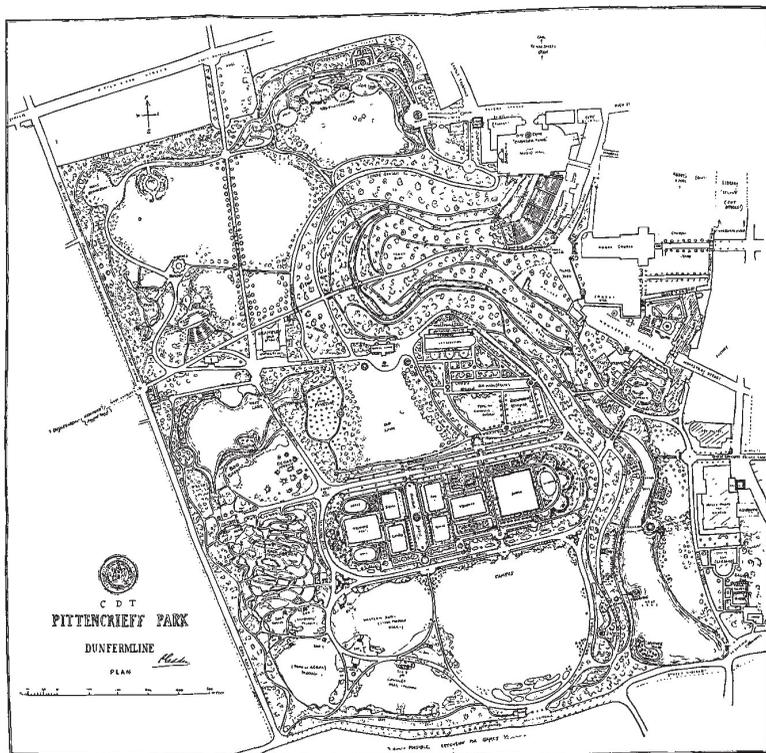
GENERAL PLAN OF PARK (See note, page 20.)
